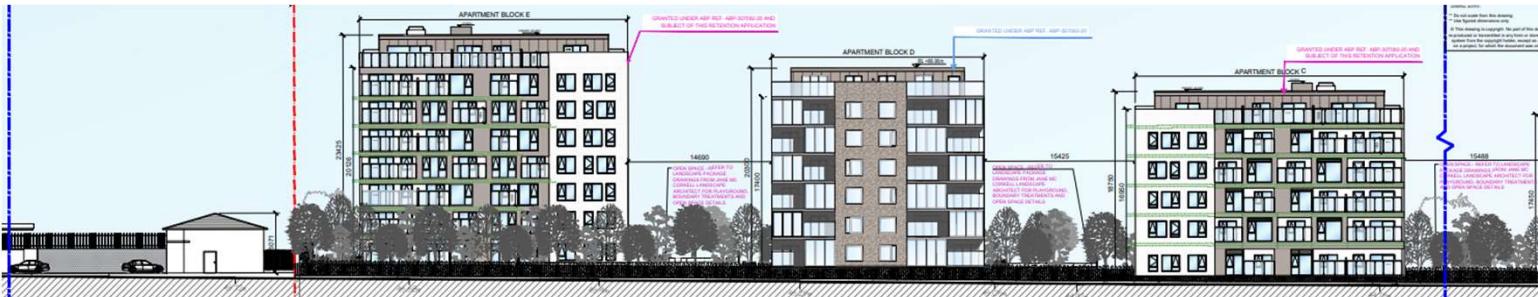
Contiguous Elevation – View Along Chapelized Bypass (N4 Road) Part 1 – Extracted from Existing Scheme
